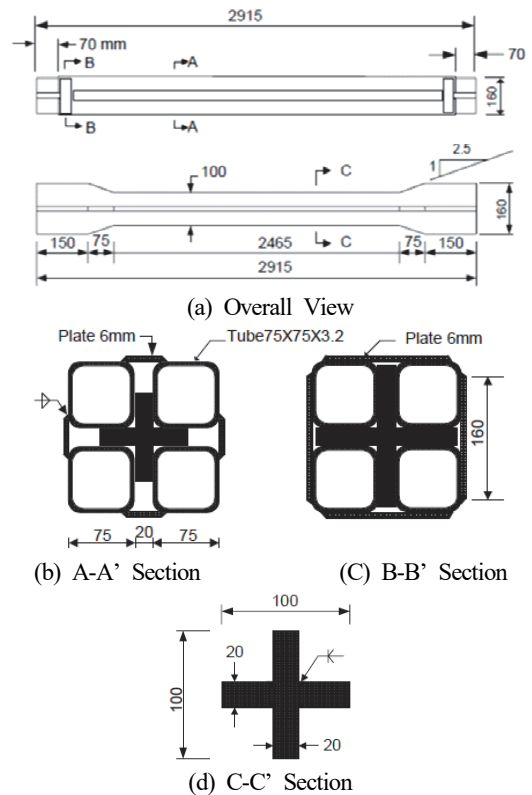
BRB specimen detail(Chen *et al.*^[9])
